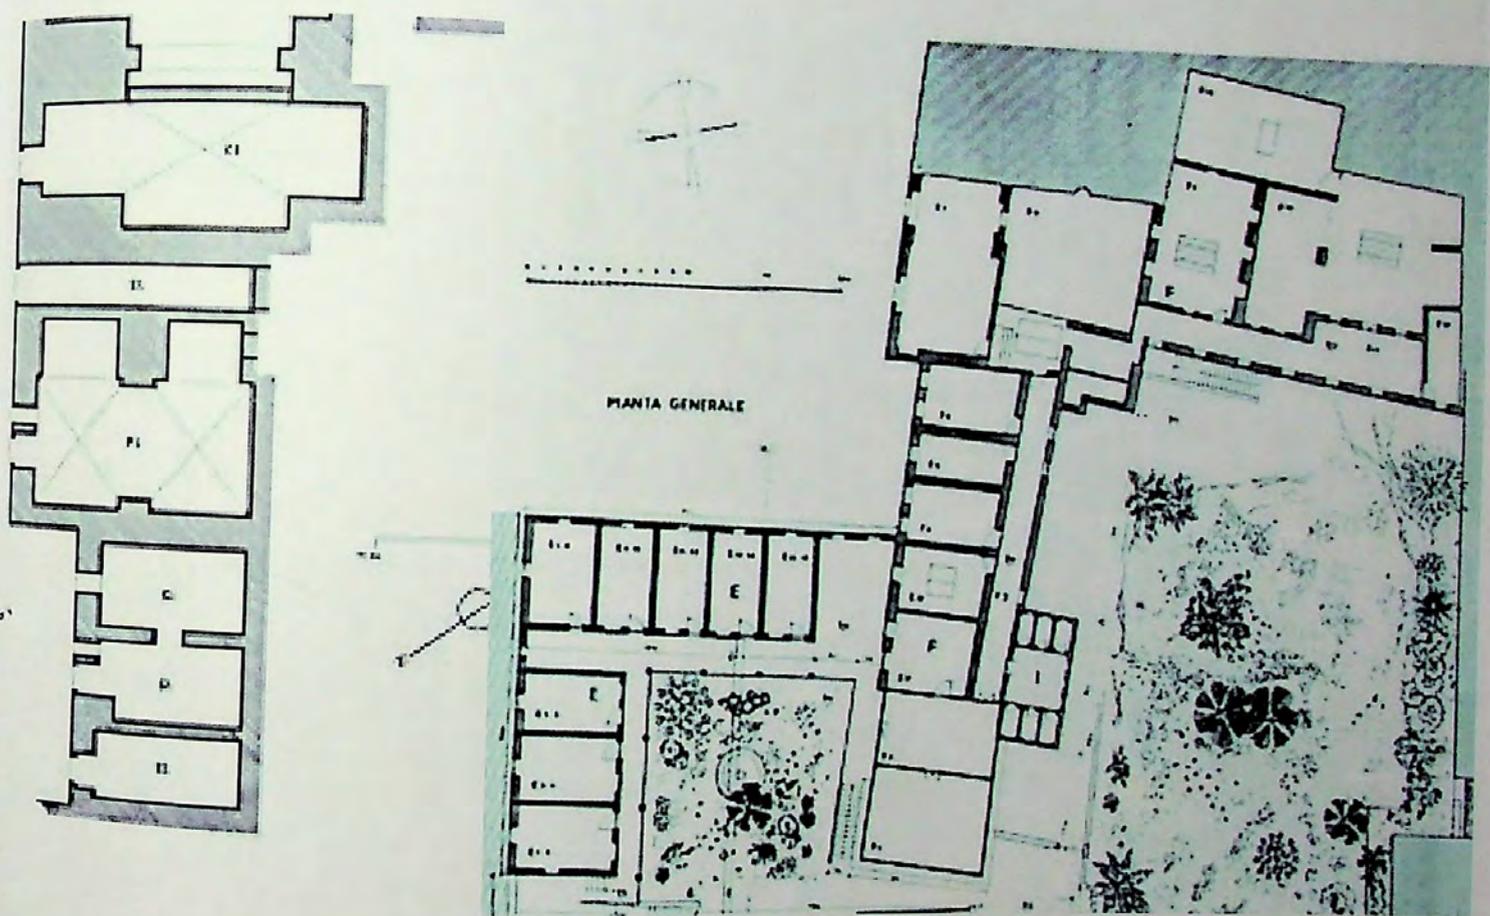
On the left: Plan showing the hall and rooms below the 15th century upper halls and their arrangement (after Revault and Maury, *Palais et maisons du Caire*).
